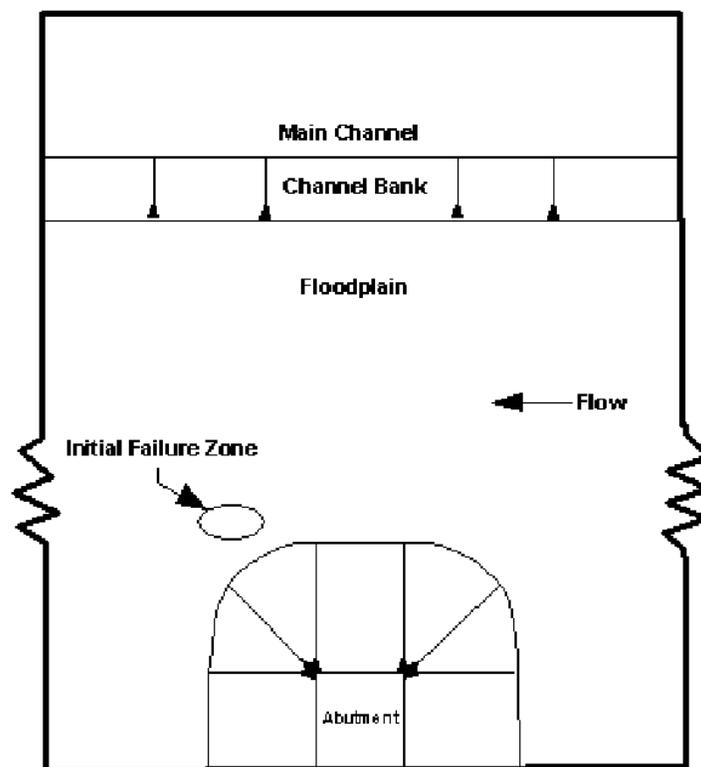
Plan view of the location of initial failure zone of rock riprap for spill-through abutment.
